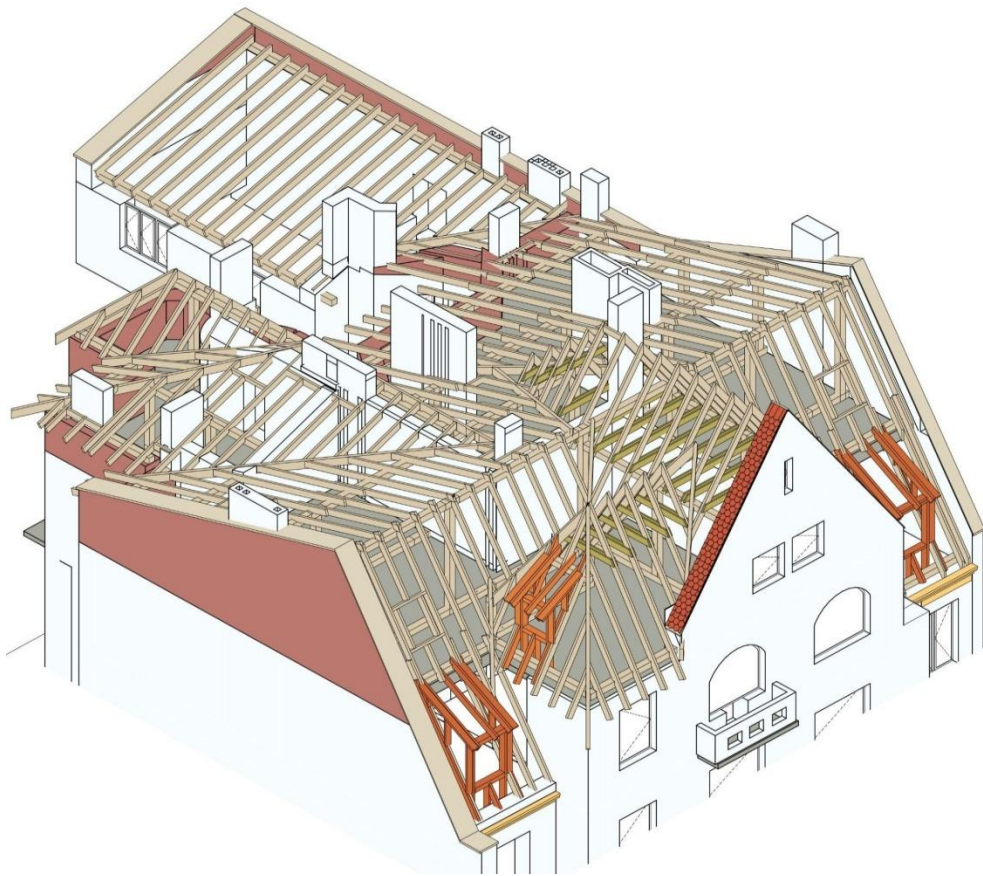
3D diagram of the roof structure of Building No. 44 on Konovalts Street, developed for the restoration project in 2025 (source: Ihor Bokalo, IE)
